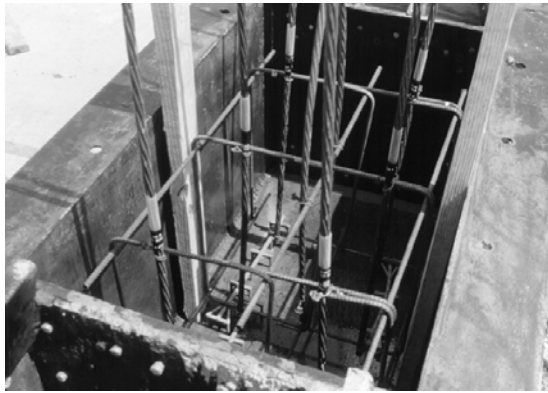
Steel Cage and Prestressing Strand in Pull-Out Block
